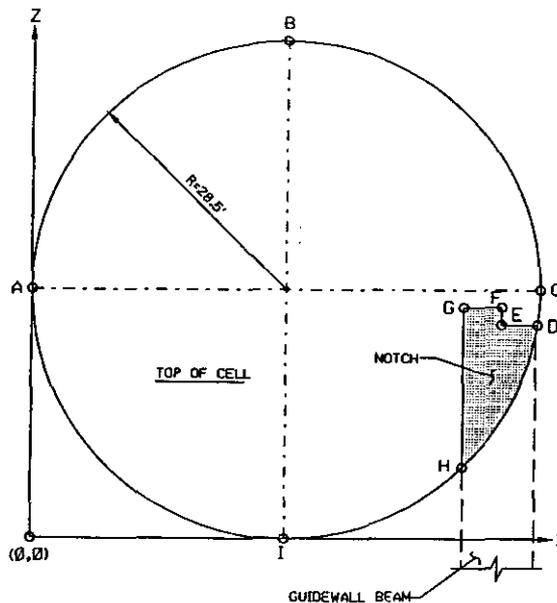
Typical Plan View of End Cells for Lock No. 22
